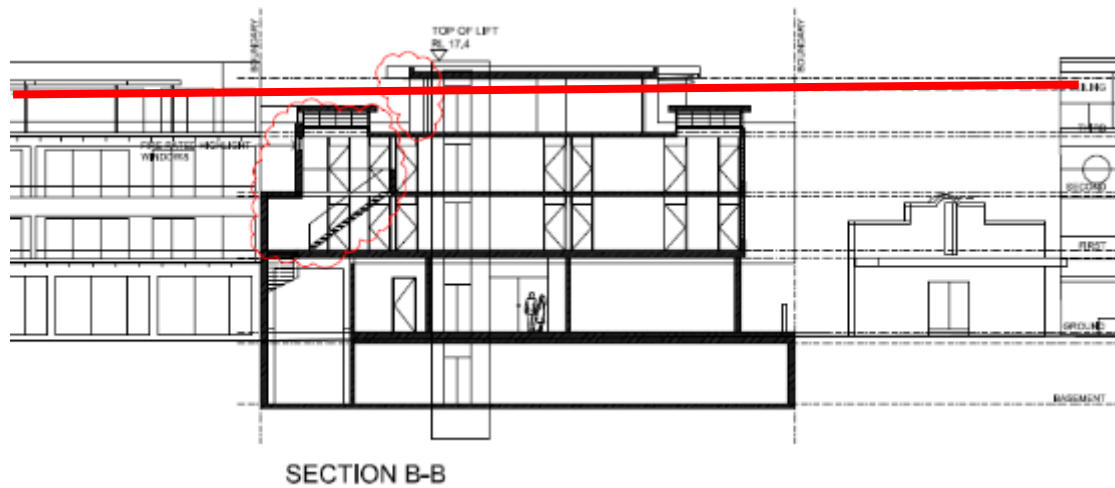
Plan (section B-B) extract showing extent of 11 metre building height breach
